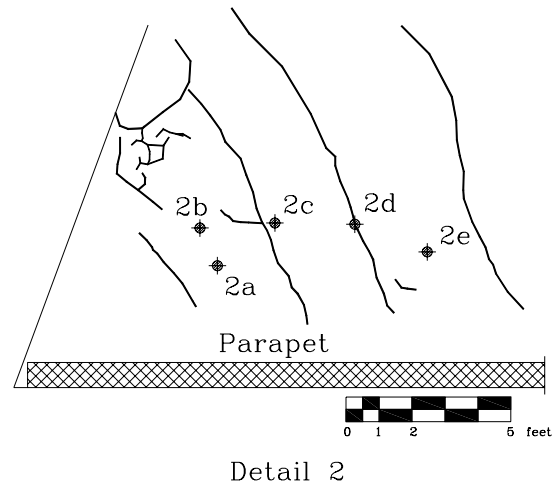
Map of cracks at coring locations for Bridge Deck Number 2
